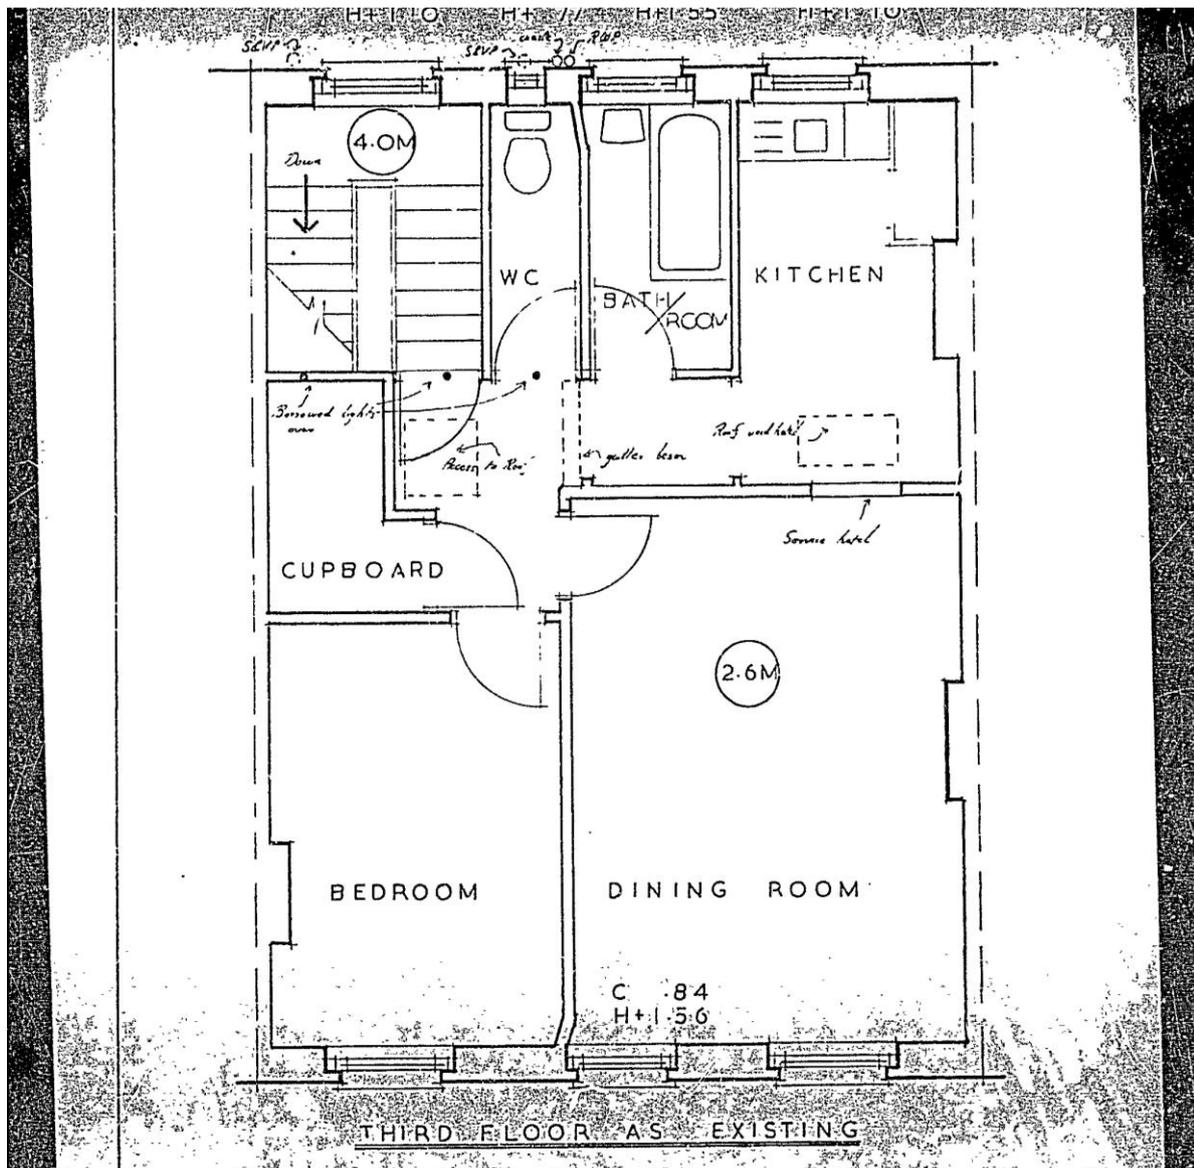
An extract of the existing third floor plan of 20 Manchester Street, submitted in 1983 under ref 83/01576/LBC.
